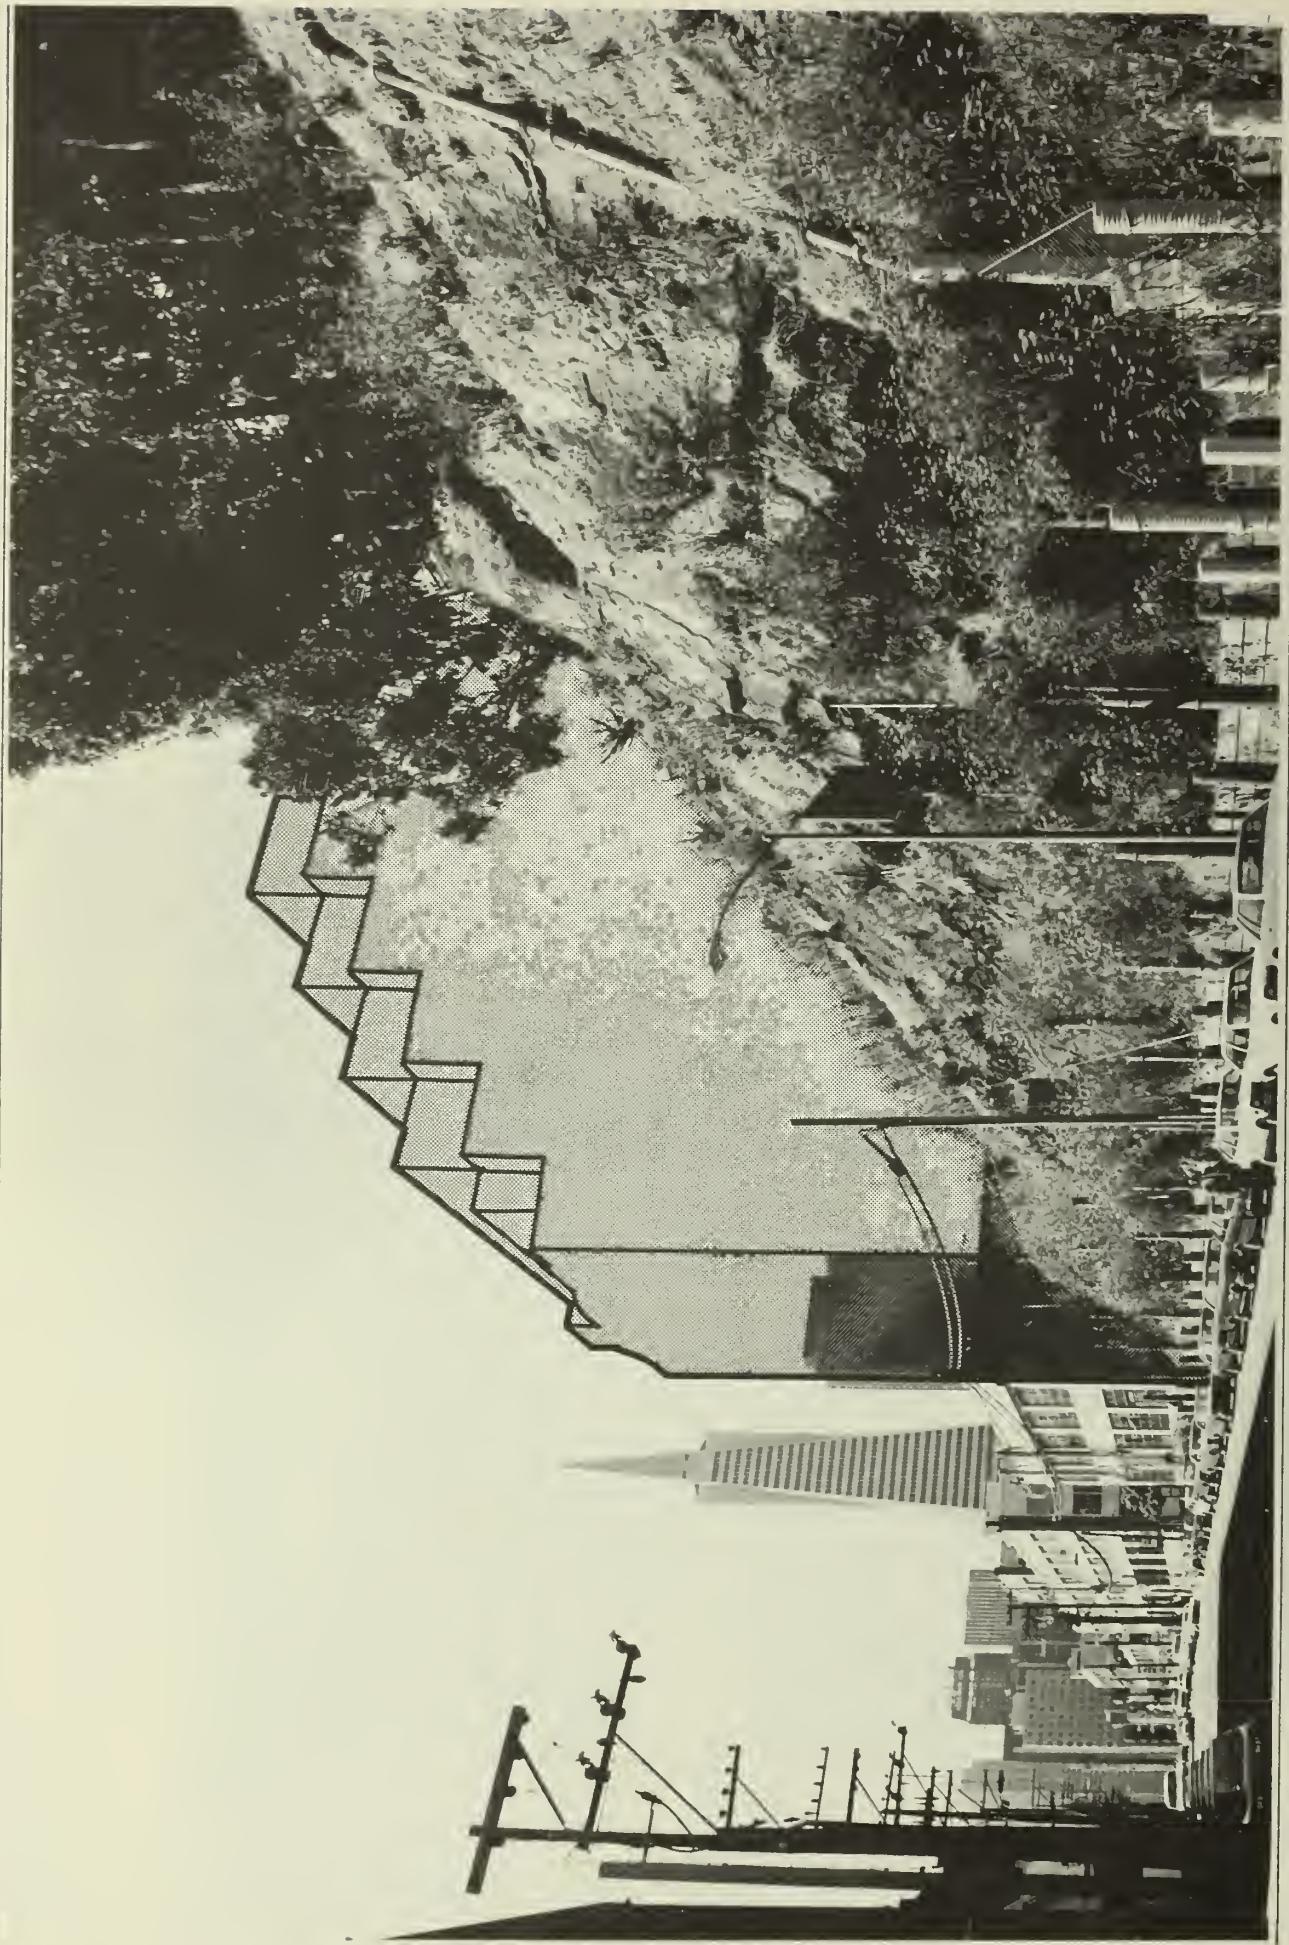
BUILDING OUTLINE MONTAGE OF PROJECT
